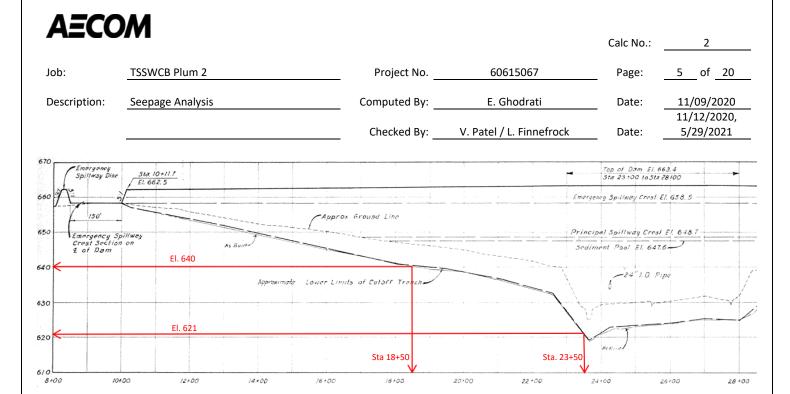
Pre-Construction Ground Surface and Cutoff Trench Bottom Elevations (Looking downstream)
